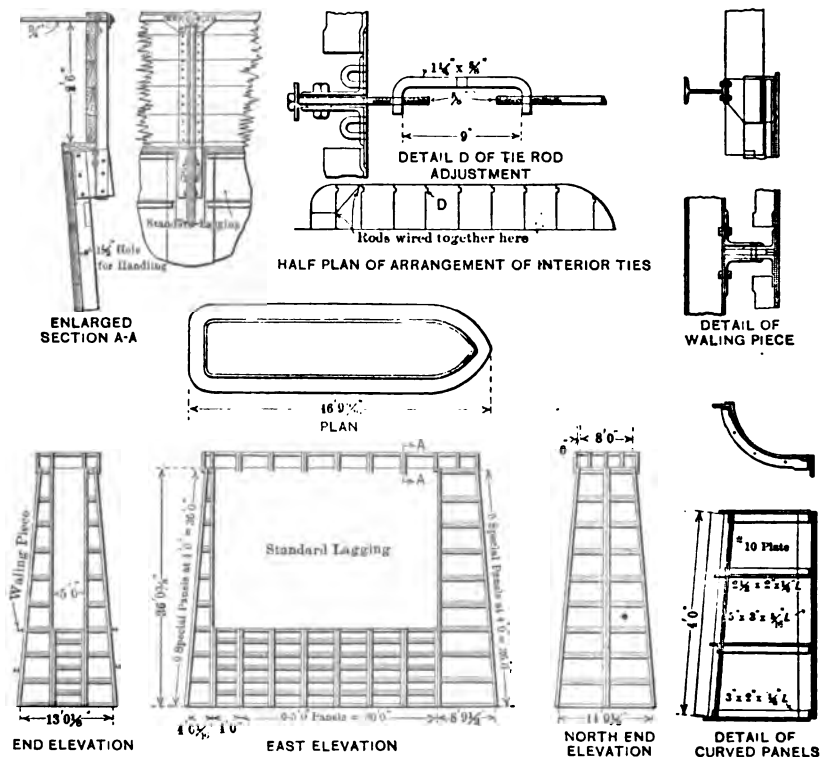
STEEL FORM PANELS, PIQUA BRIDGE.
